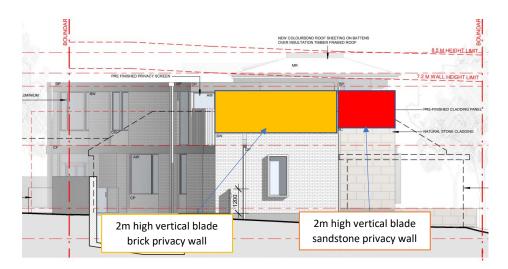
Front elevation of the proposed dwelling with suggested privacy walls to ameliorate potential overlooking of 3 Sherwin St
